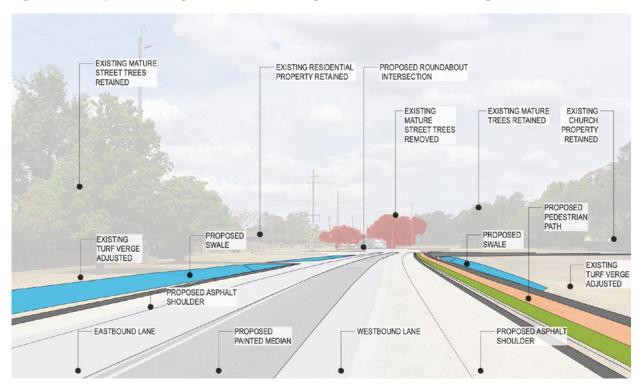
Viewpoint 8 - Proposed view of Inalls Lane looking south east towards the Castlereagh Road intersection
